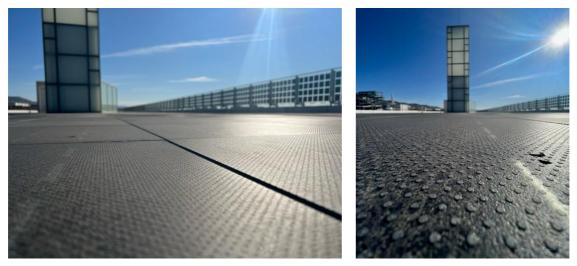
Details of the walkable floor modules and the non-slip surface finish
